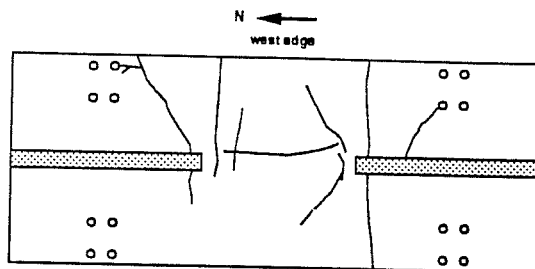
Sp. 2b: Progression of Cracking of Bottom Face of Second Floor Slab at Load Point 177
